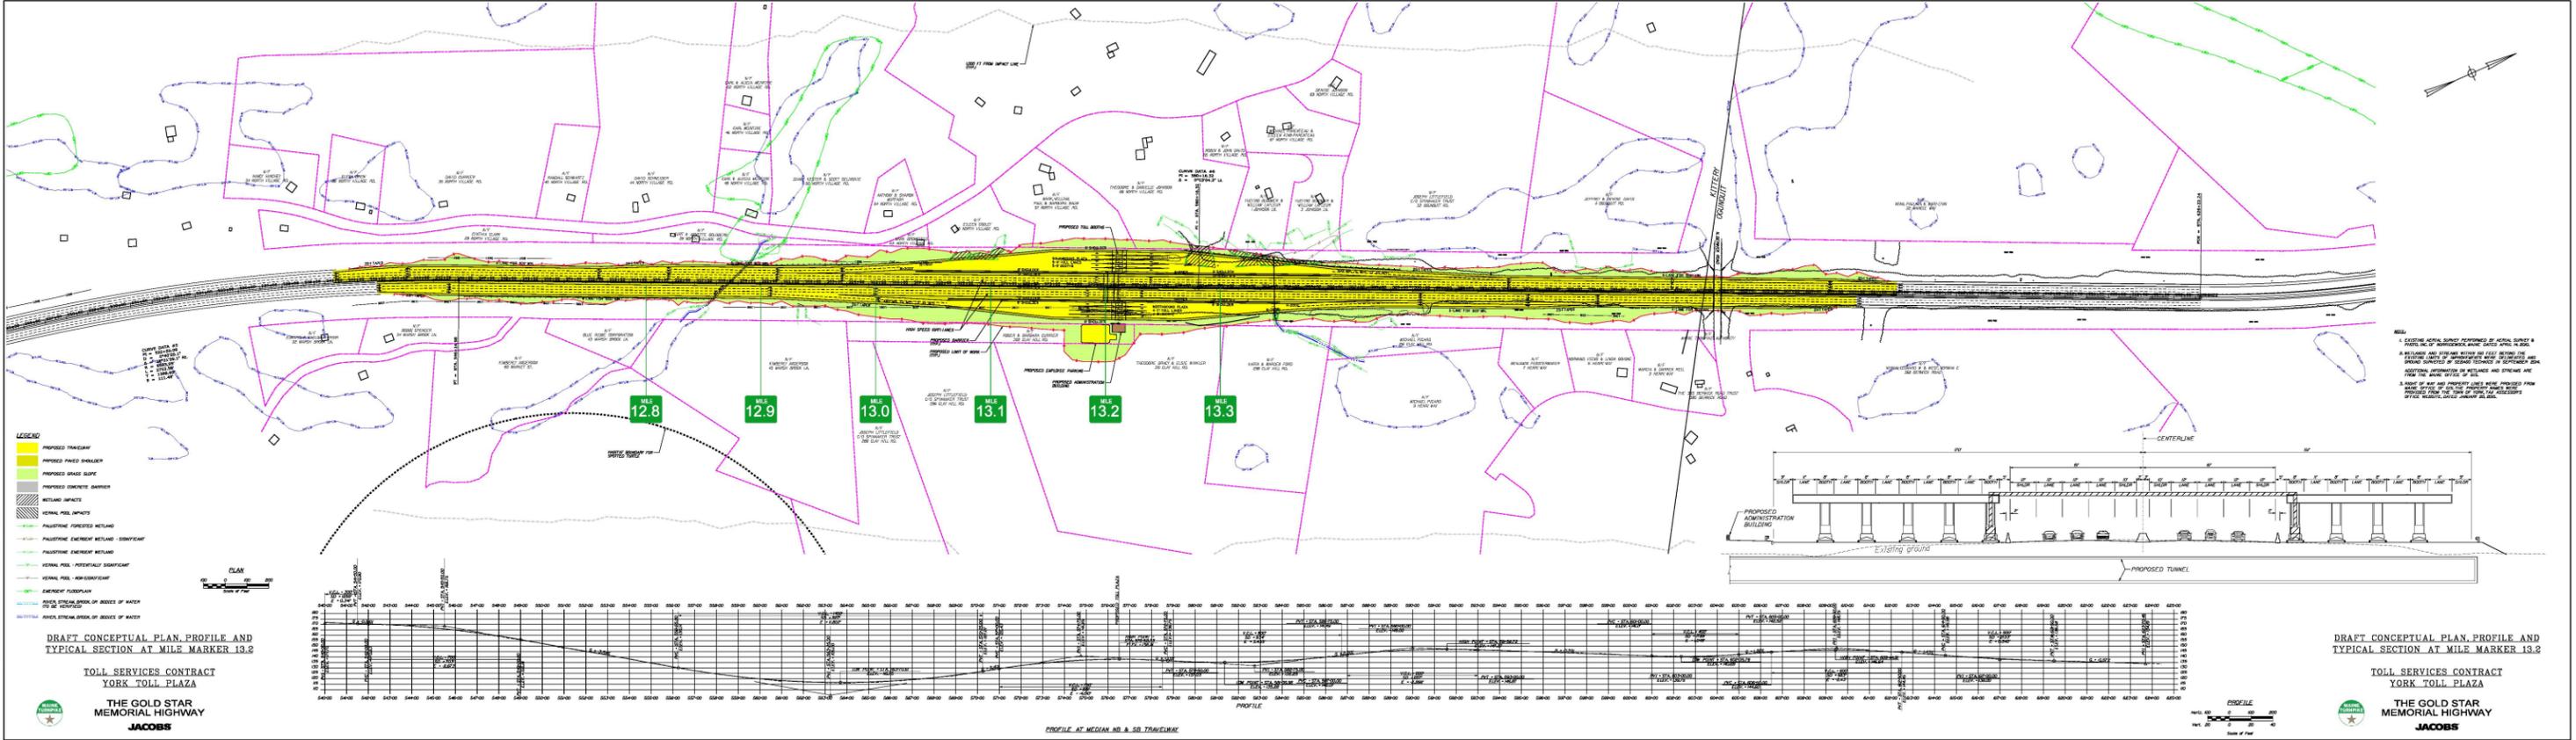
Conceptual Plan, Profile and Typical Section at Mile 13.2
